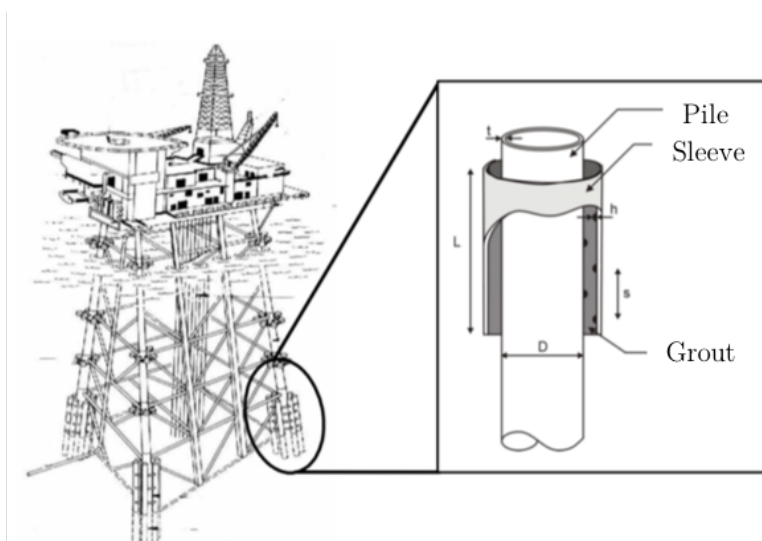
Grouted joints in offshore platforms : location and general construction [2]
